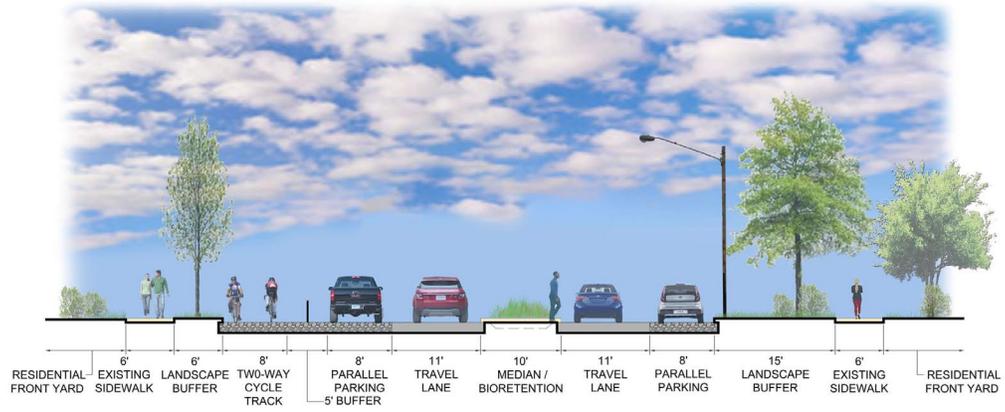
5th Avenue Complete Street (16th Street to 13th Street)
